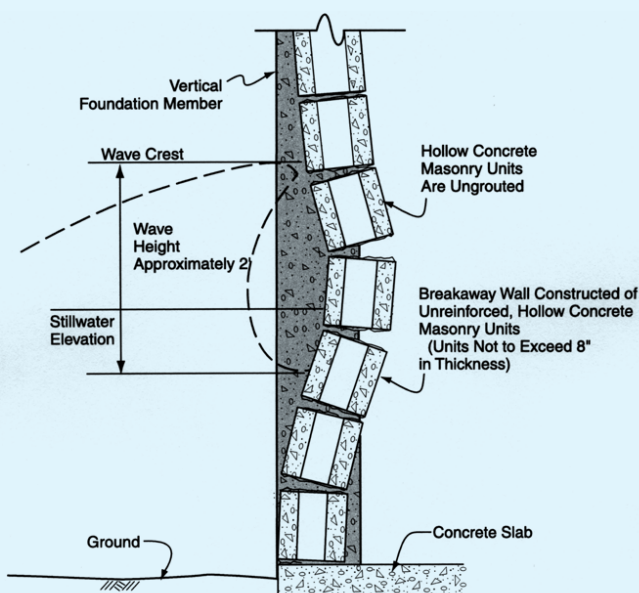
Compressed air trapped between a breaking wave and a vertical wall generates extreme horizontal pressure, often leading to structural failure. Reprinted with permission from the FEMA Technical Bulletin 9-99 (FEMA, 1999).
